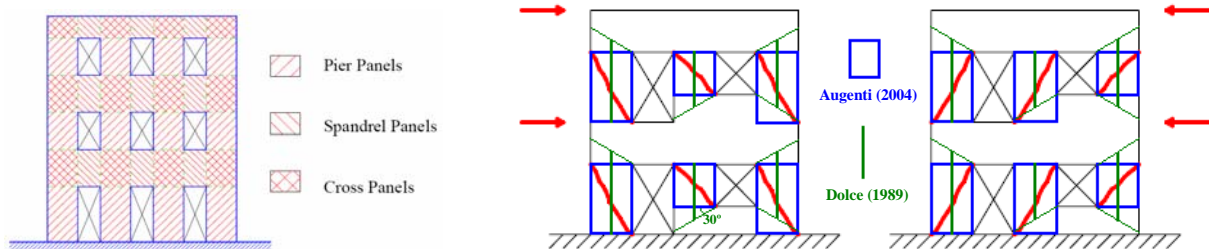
Wall division in macro-elements (left) and definition of the height of pier panels (right)
